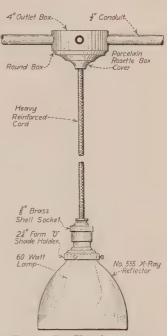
Showing arrangement of lighting unit used in illuminating the University of Illinois Machine Shop.
